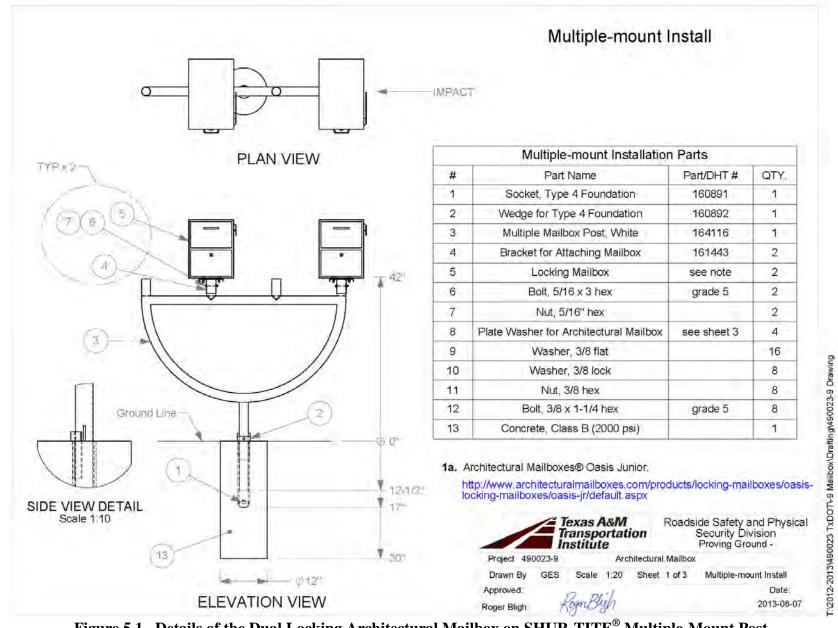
Details of the Dual Locking Architectural Mailbox on SHUR-TITE® Multiple-Mount Post.
